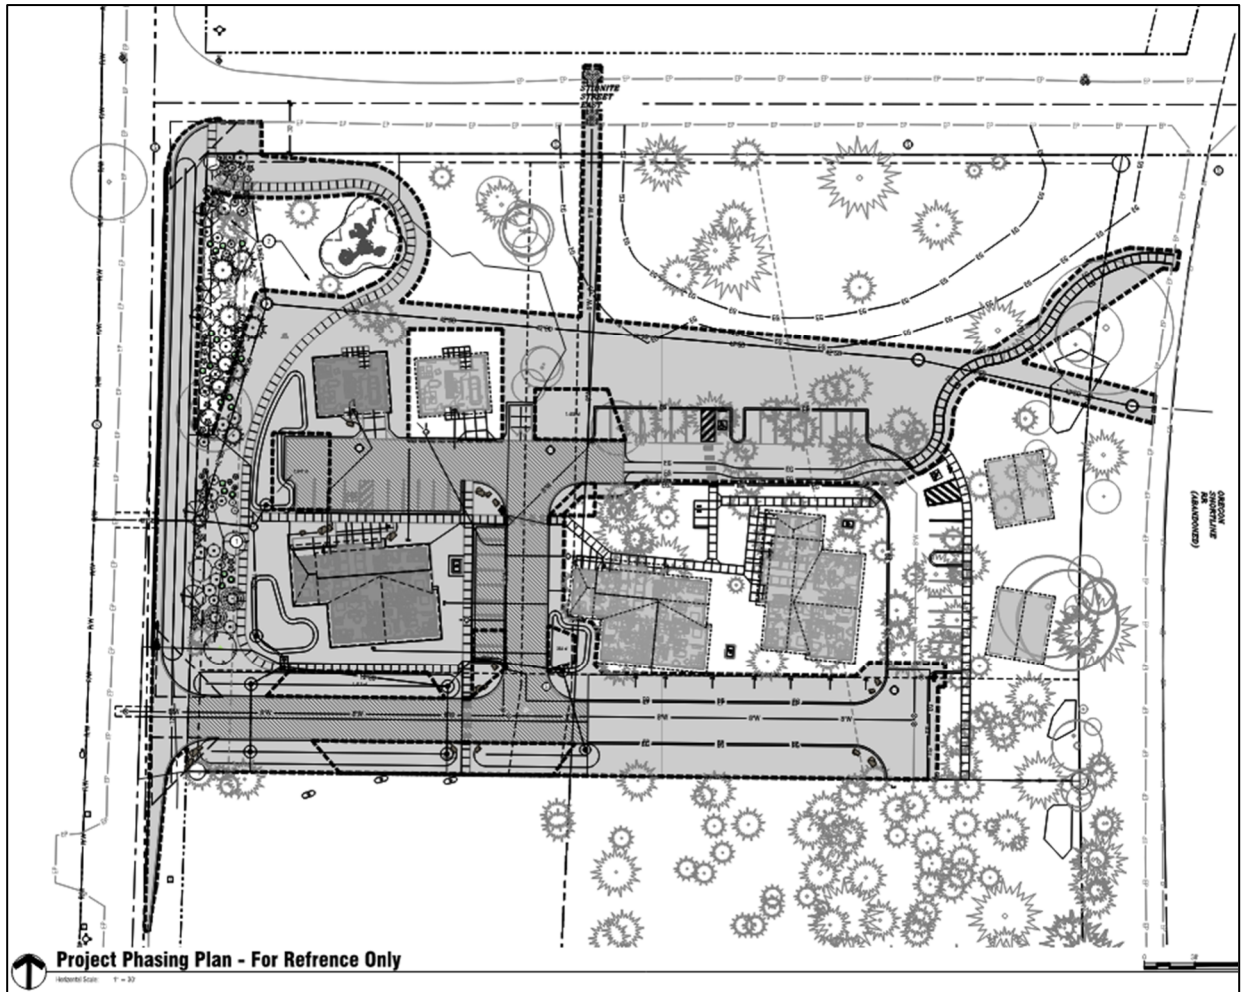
Phase One Site Plan – Refer to full drawing set additional detail
